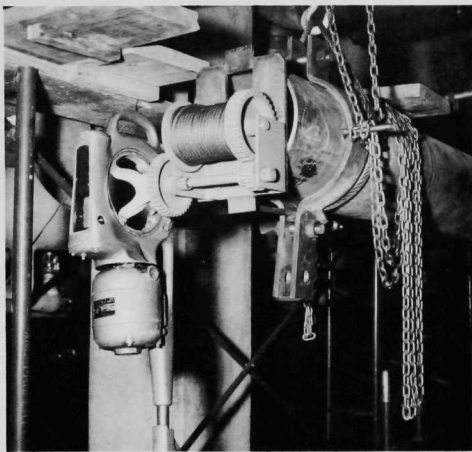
Winch and Portable Power Drive for Pulling "Pigs" through Pipe.
